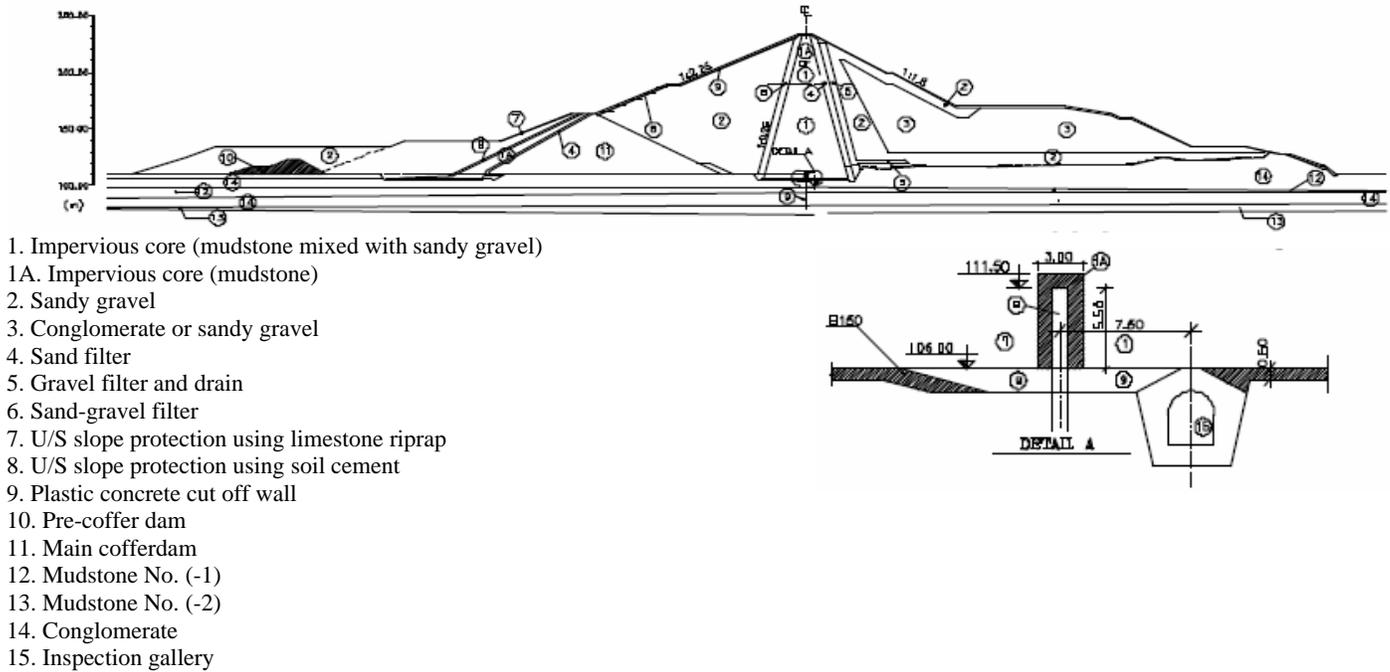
Cross section of Karkheh storage dam (Karkheh Dam Section Engineers, 1995)
